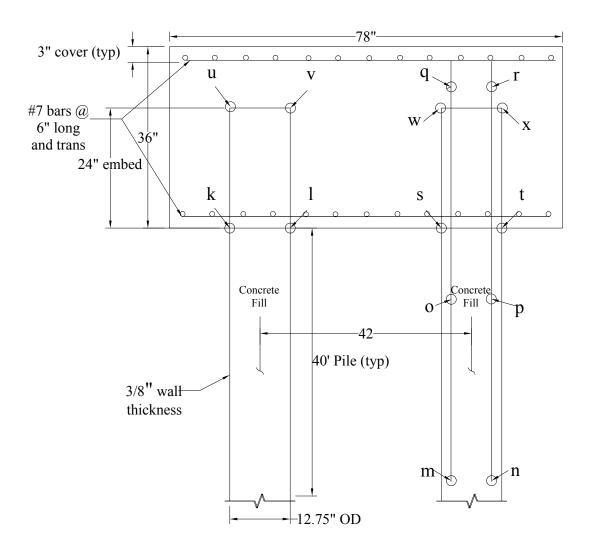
Pile Cap 4 with construction details and instrumentation layout.
